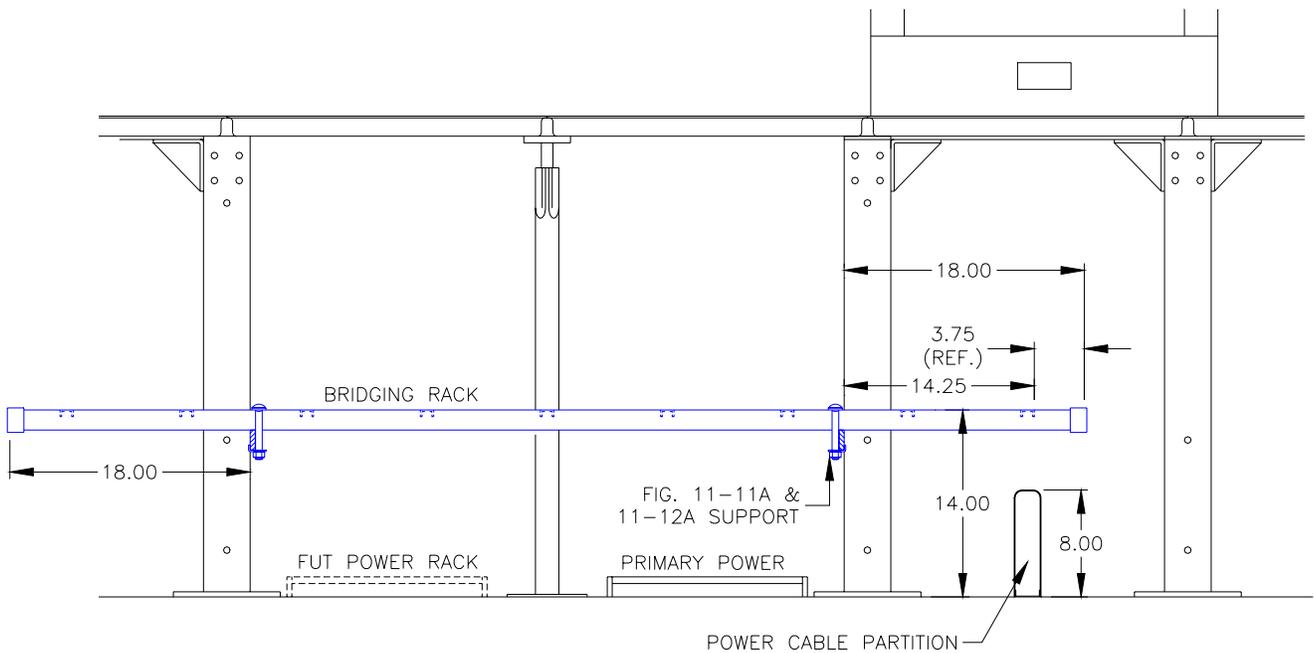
A – Bridging Cable Across Main Cross Aisles
